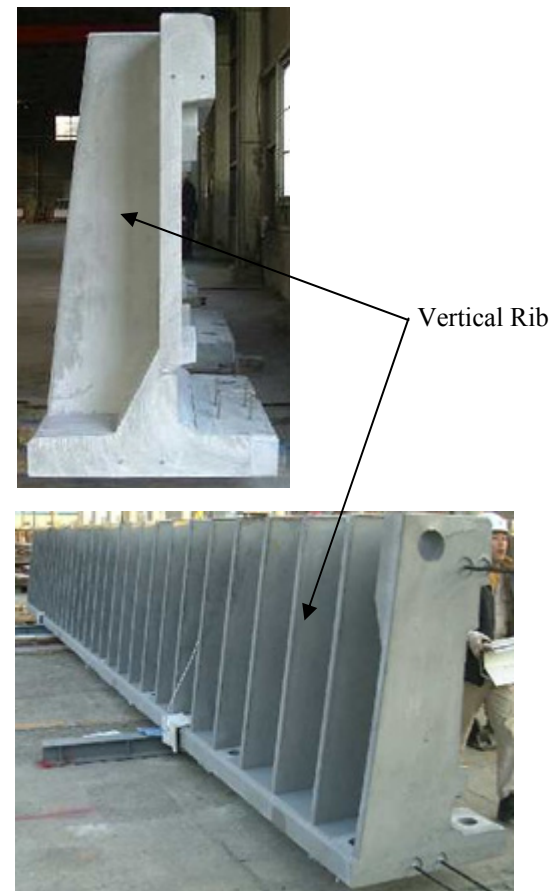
Cross-Section and Back Side of Newly Developed Guideway Sidewall
